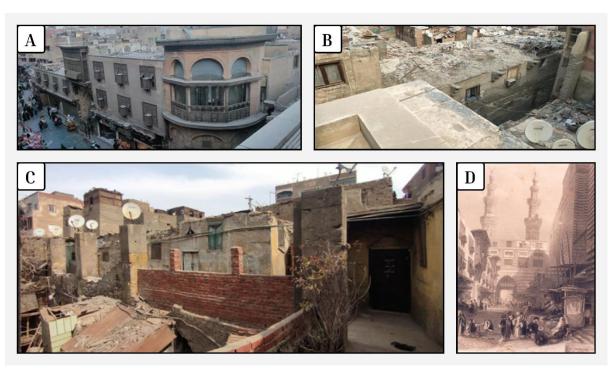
Evidence of two floors above the ground floor of the agency; A) Remnants of the second floor; B) Visible cables along the side façade; C) Dilapidated columns extending to the second floor; D) Historic drawings by artists such as David Roberts showing the second floor [36].
